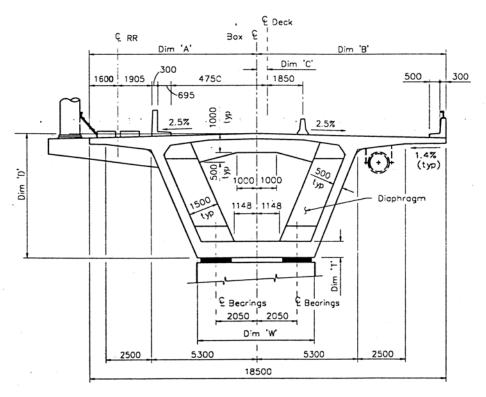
Typical section at pier (source: JMB As Built Drawing).
